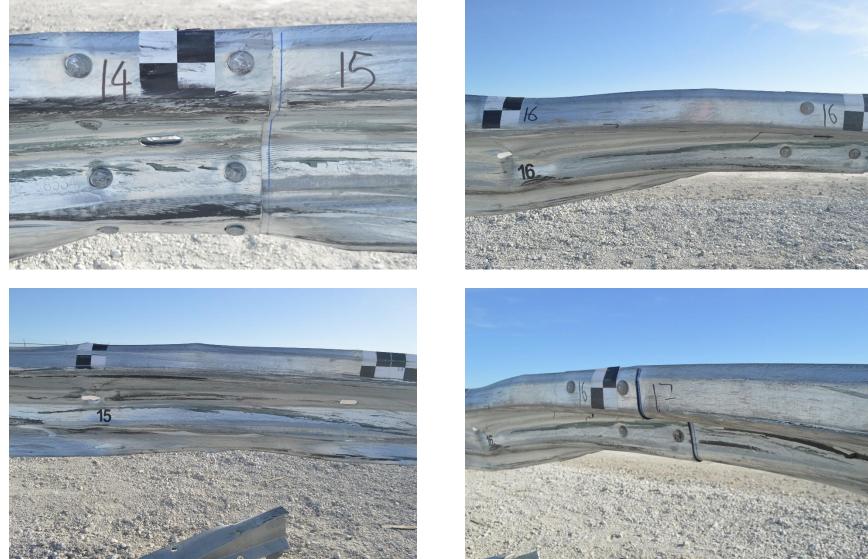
System Damage, Guardrail at Post Nos. 14 through 17, Test No. MGSC-8
